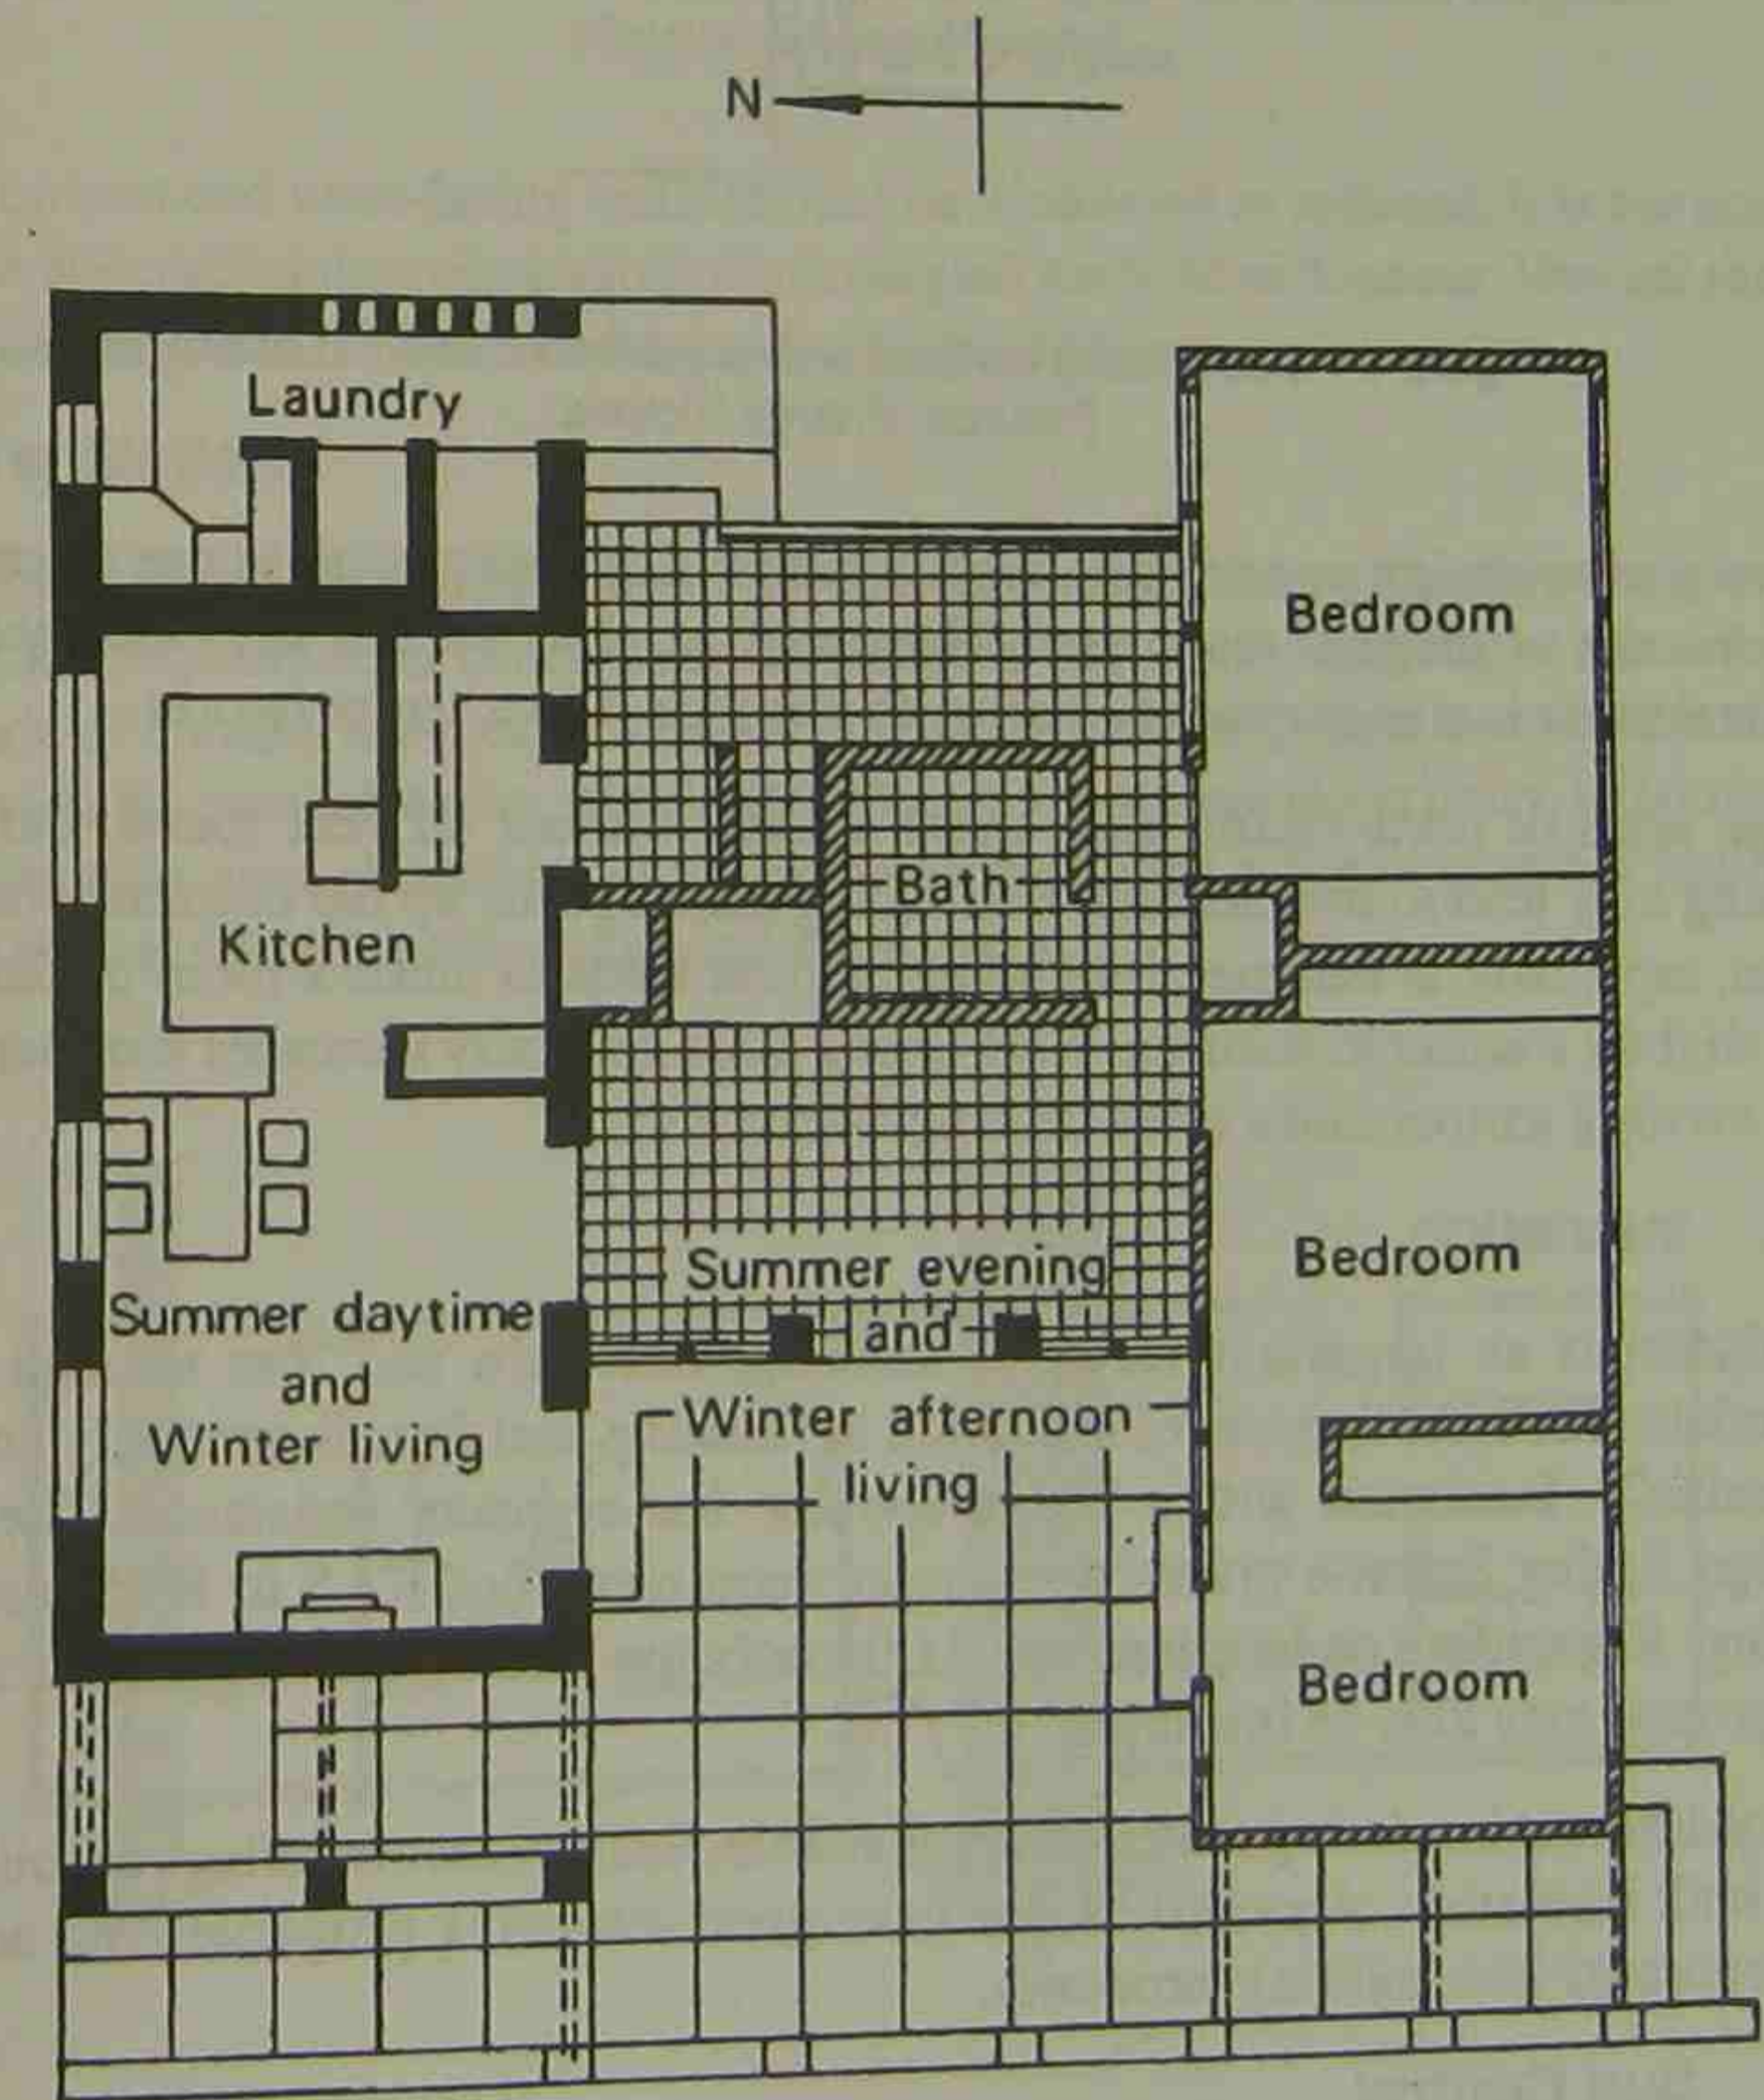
House design for hot-arid climate combining heavy and light construction.
